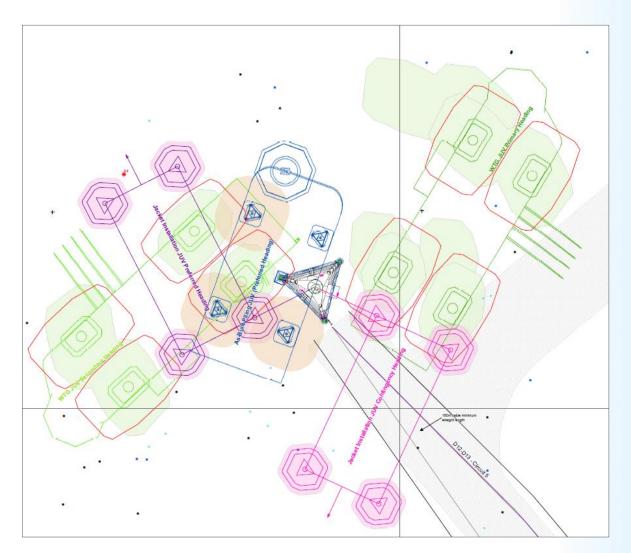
Extract from the Seabed Management Plan showing the potential jack-up locations of the three JUVs during construction: Apollo (piling), Scylla (substructures and topside installation), and Bold Tern (WTG installation)
